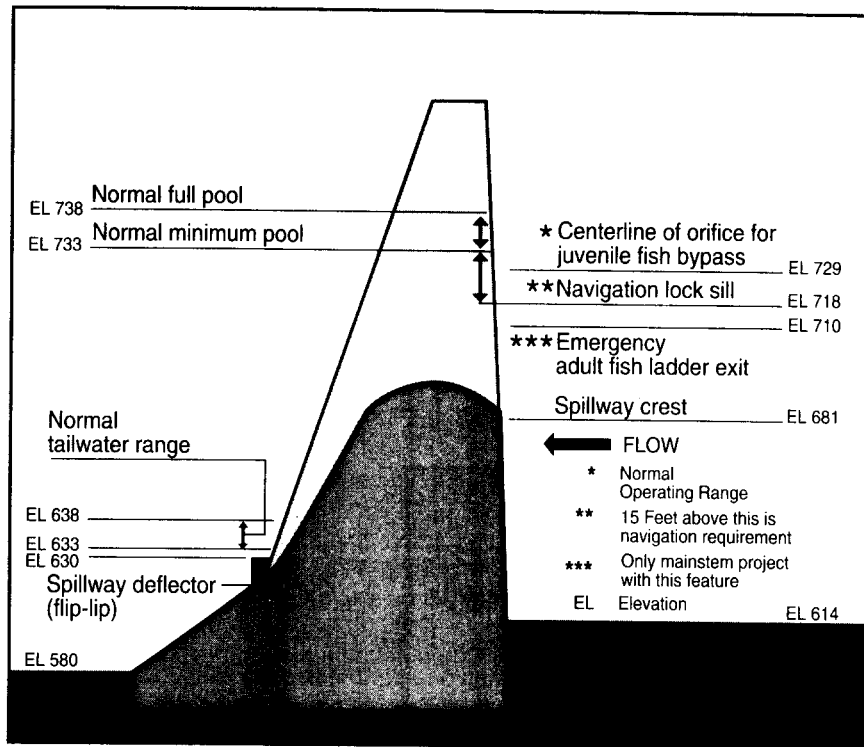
Cross-section of Lower Granite Dam showing elevations of project features. Elevations shown are feet above mean sea level (fmsl).
